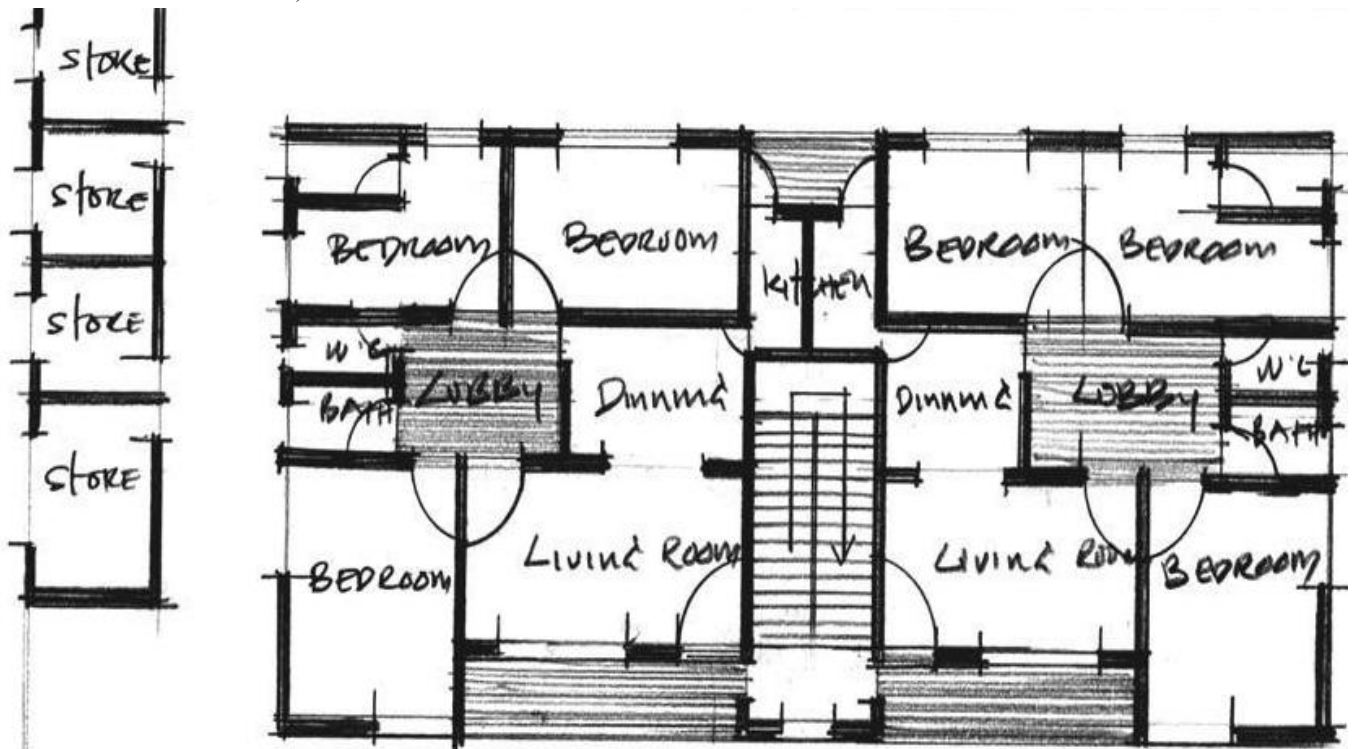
Floor plan of a typical semi-detached flat (single and double floor)
